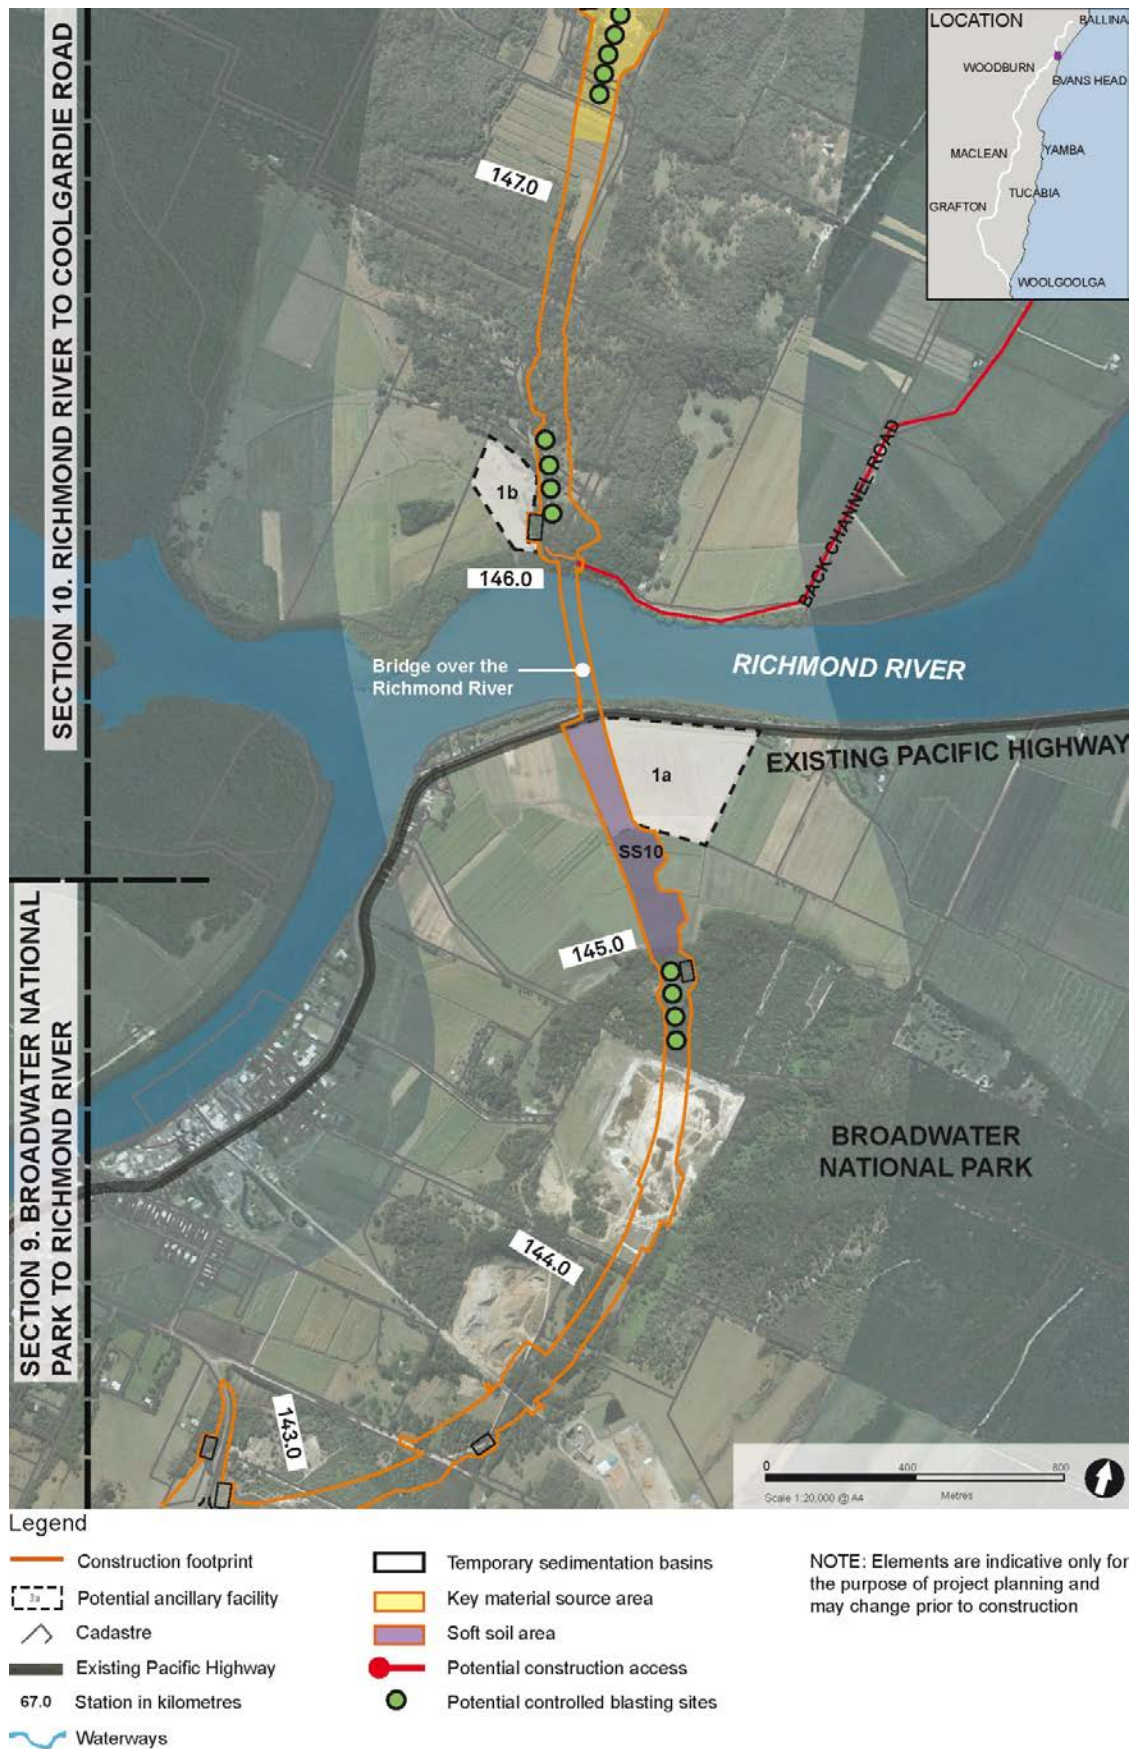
Extent of construction and construction features Section 9 (Station 143.5 to 147.4)
